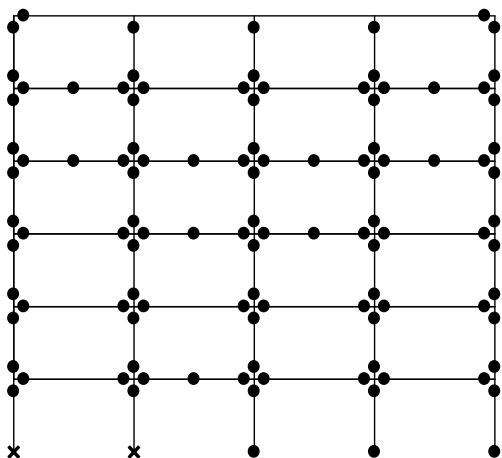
Damage to Frame 5 (SMA at the ends of the fifth floor beams)
